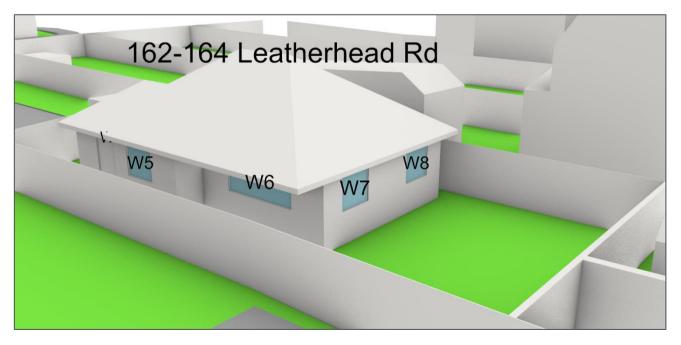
Illustration of window openings at 162-164 Leatherhead Road (view from southeast)
